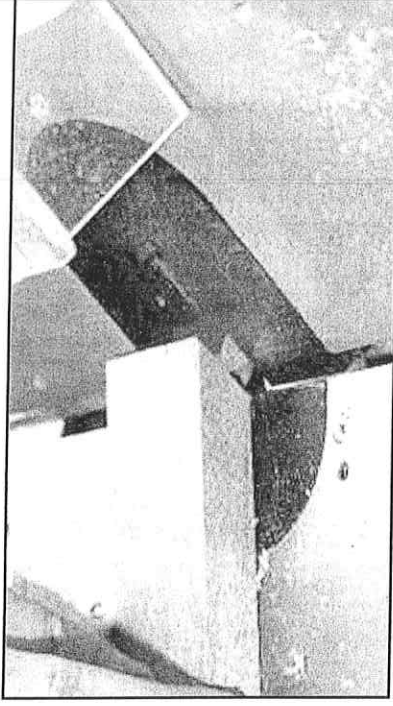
The cross piece is placed at the desired location using a carpenter square’s 45° to align. The mid-point of the socket pieces are marked on each apron.
